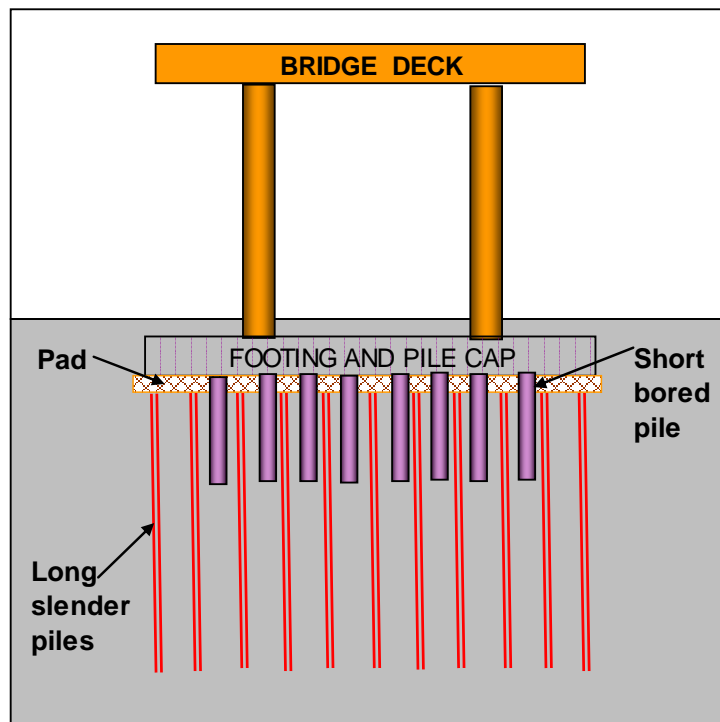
Piled pad foundations for the Golden Ears Bridge piers.
